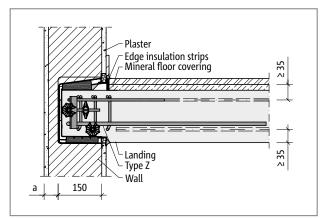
Schöck Tronsole® type Z: Fire protection configuration
